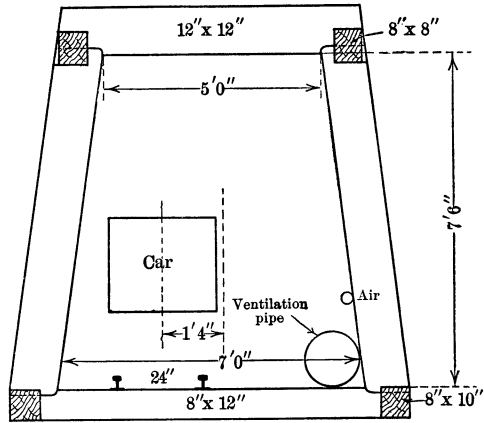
Arrangement of timbering providing a manway at one side of the tunnel.
